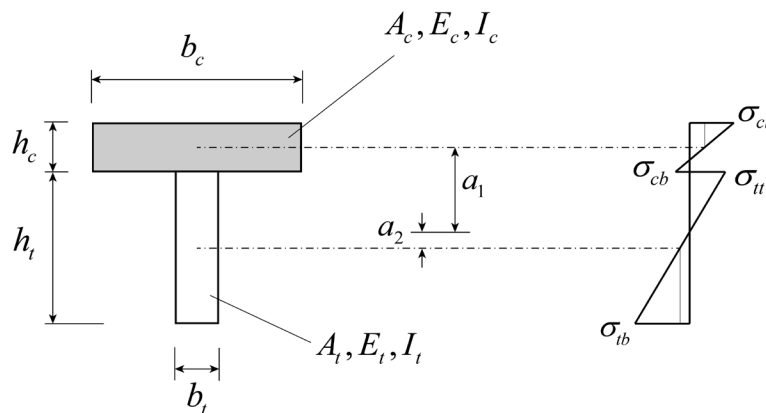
Cross-section of the TCC floor (left) and distribution of bending stresses (right)
